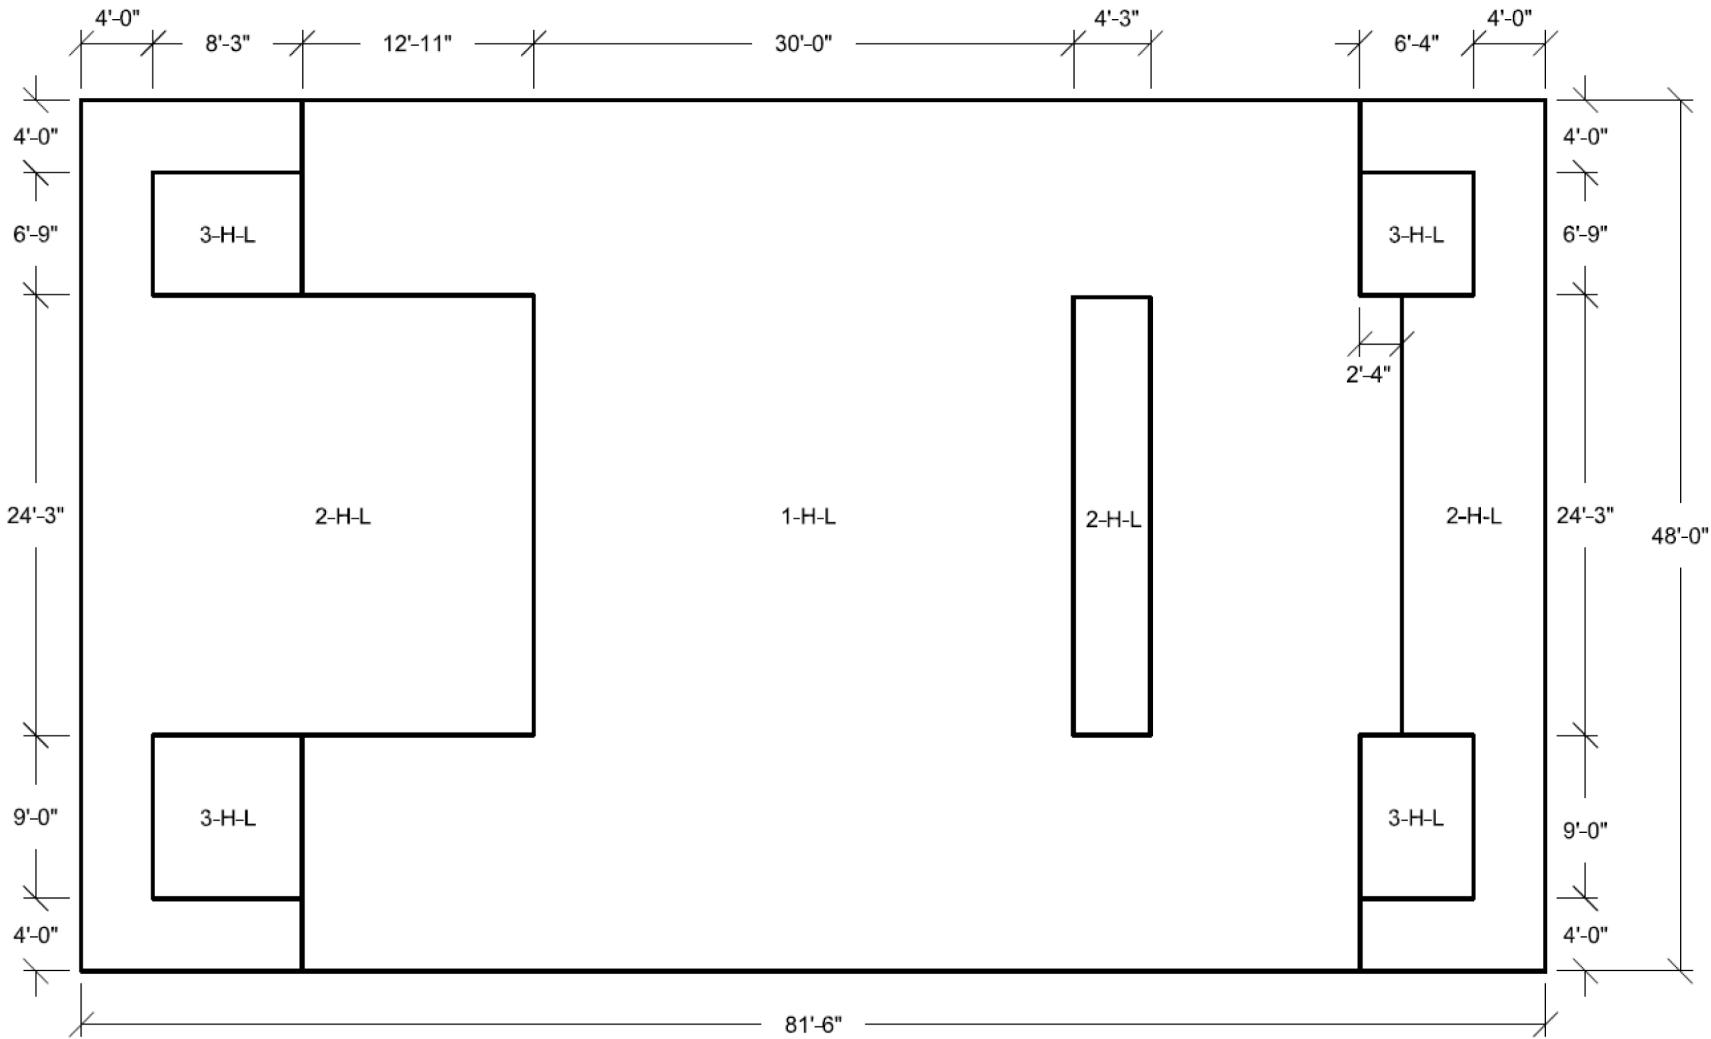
H.6-141 DGFOSV Wall and Slab Labeling Convention
